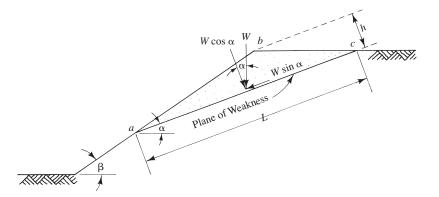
Sketch showing forces acting on inclined layer of impermeable soil.
